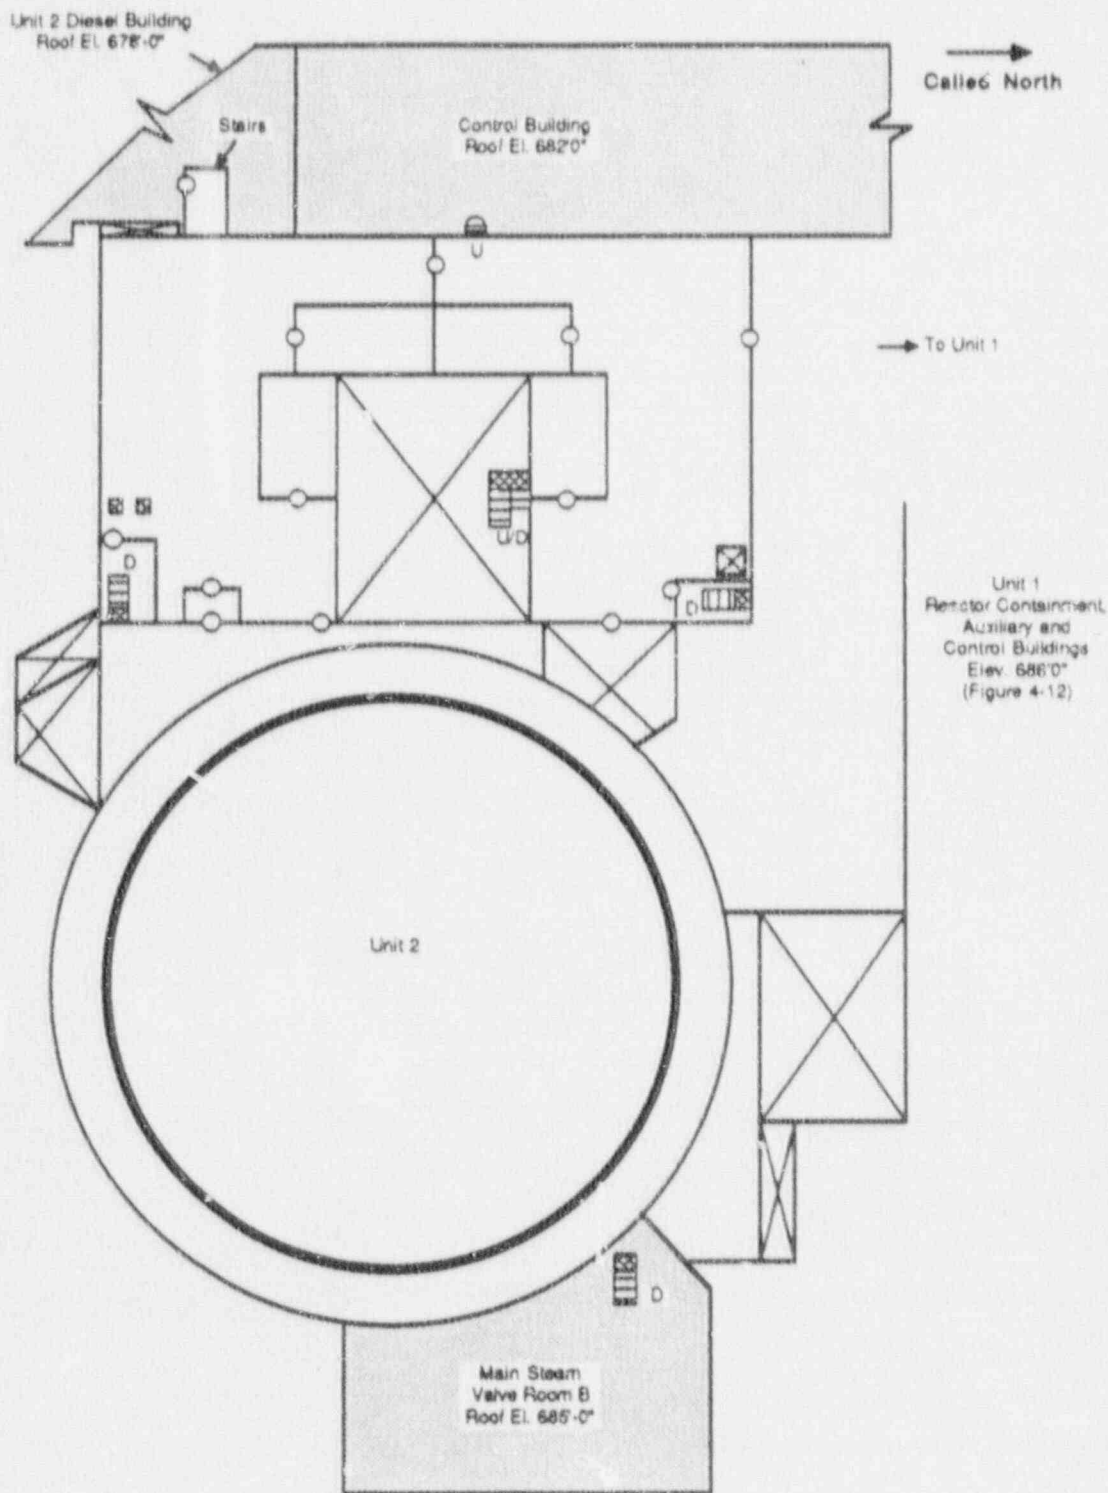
Bellefonte 2 Reactor Containment, Auxiliary and Control Buildings, Elevation 686'-0"
